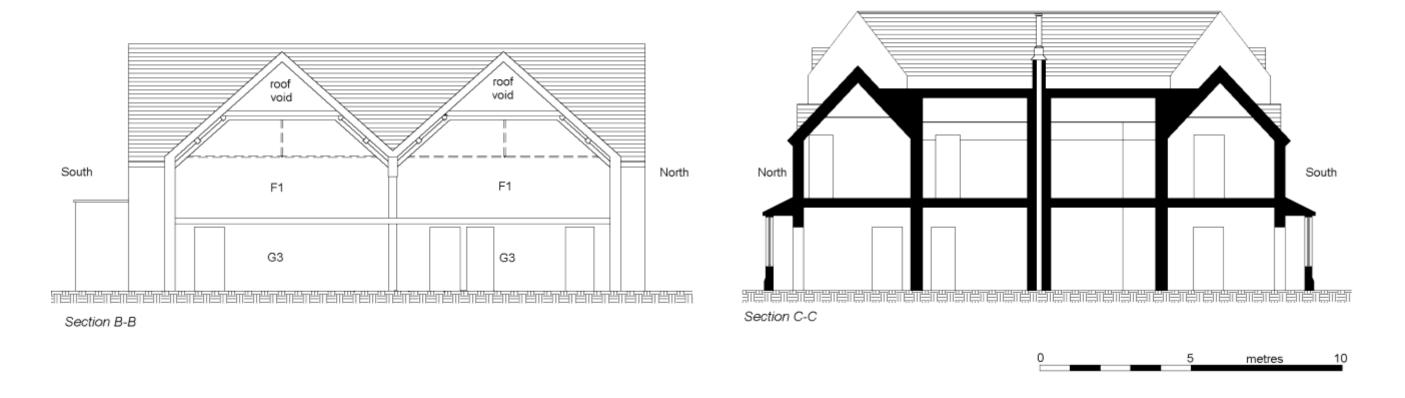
Sections through building (scale 1:125) for locations, see Fig. 15
